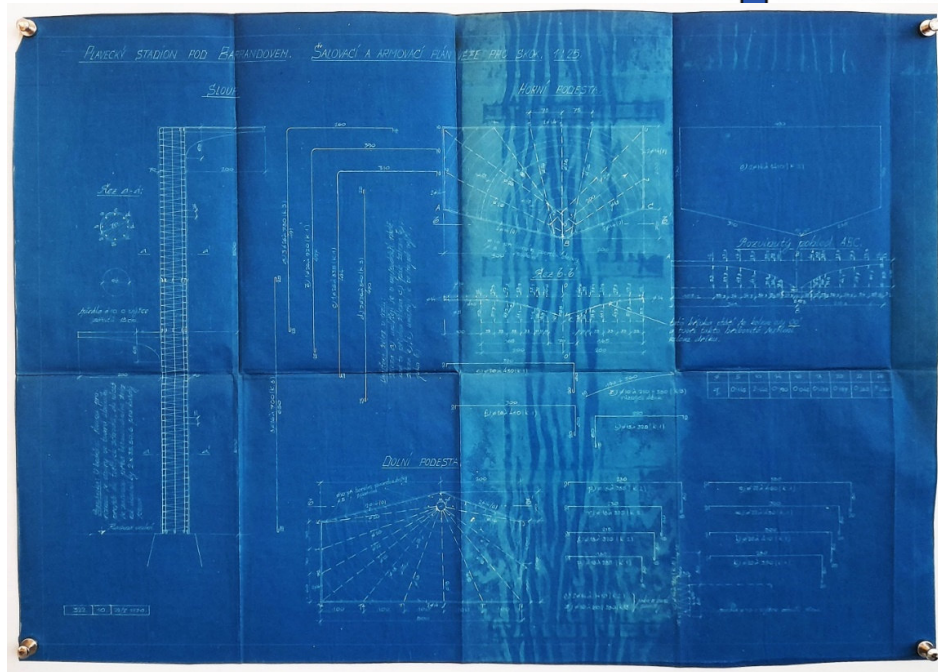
Plan of the formworks and reinforcement of the diving tower in scale 1:25.
